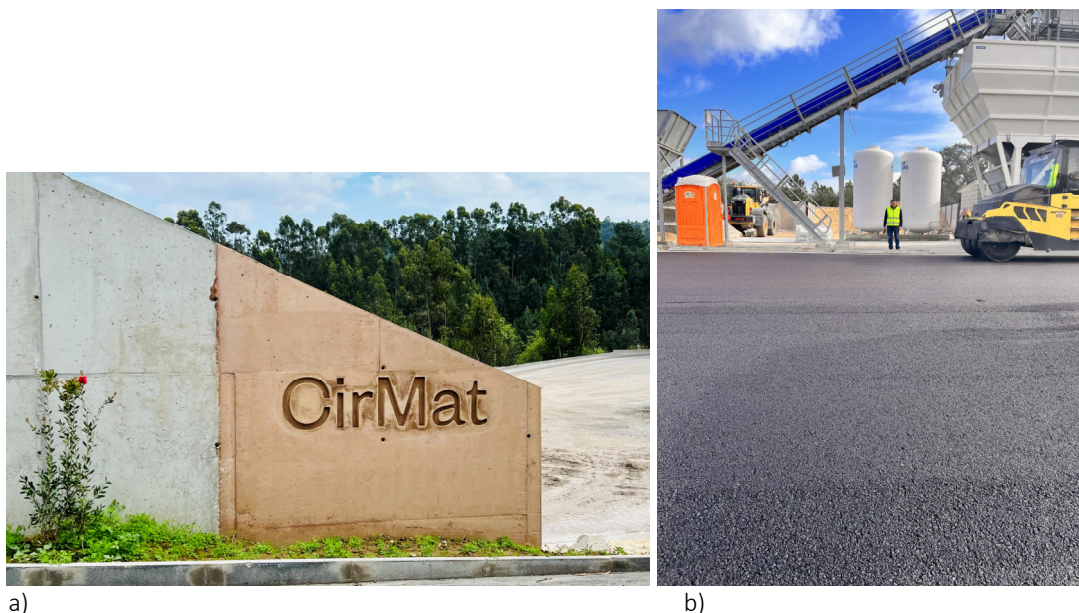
a) reinforced concrete wall with EAF SSA and ceramic powder; b) experimental section of bituminous mixtures with EAF SSA
